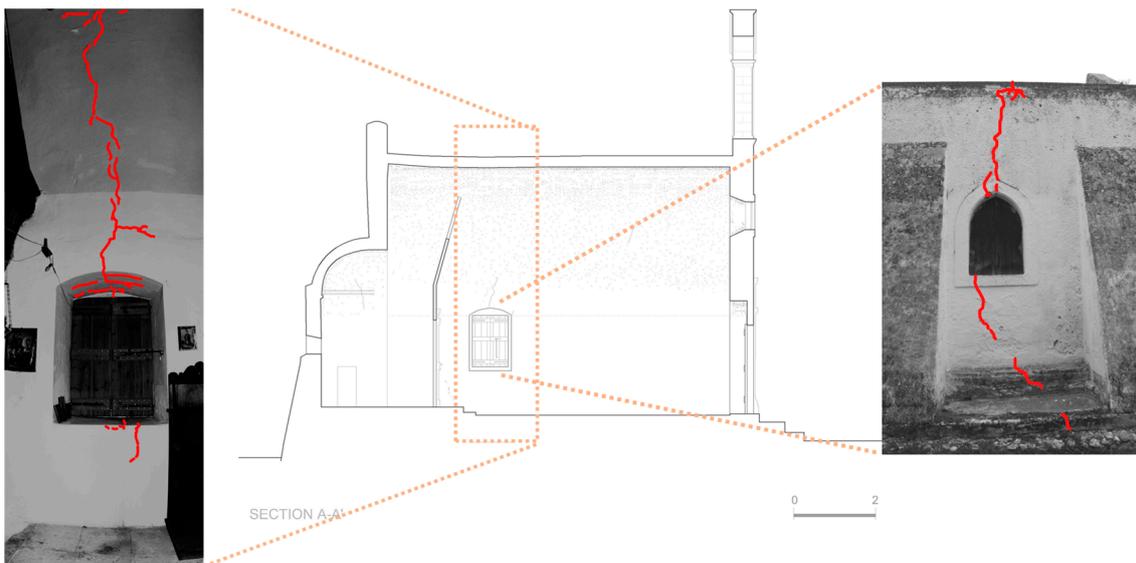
Section A-A'. Internal and external damages on the south wall of the church (2022).
